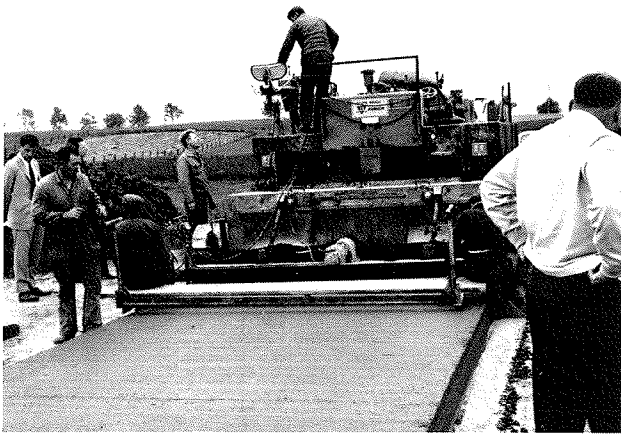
Modified asphalt finishing machine for laying concrete pavement.
